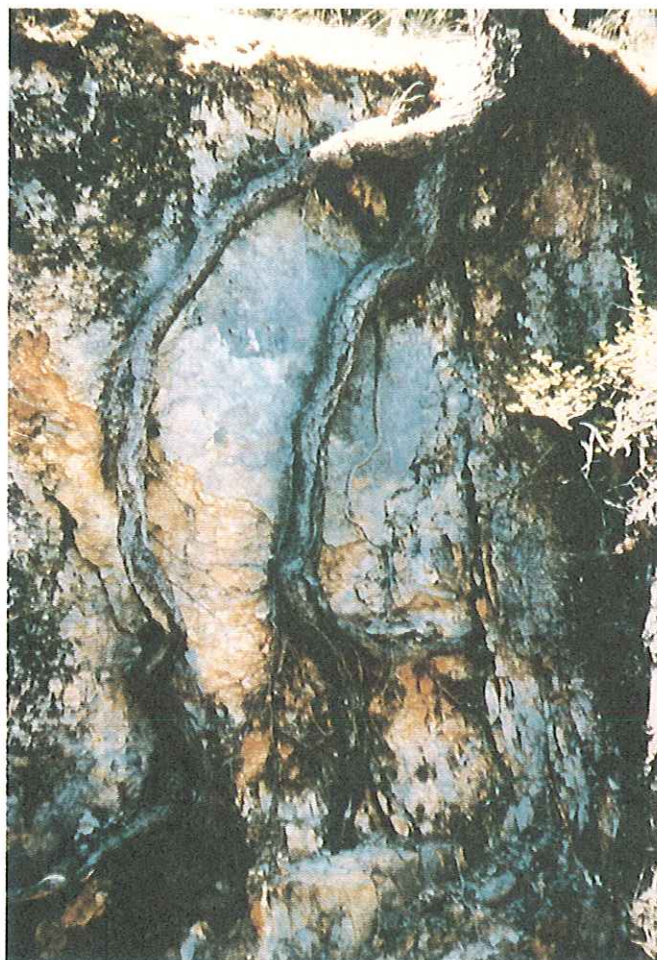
Tree roots that have pried a rock loose and created a rockfall. Winds can create high leverage forces and cause numerous falls. Trees on slope and within about 6 feet of slope crest should be removed.
